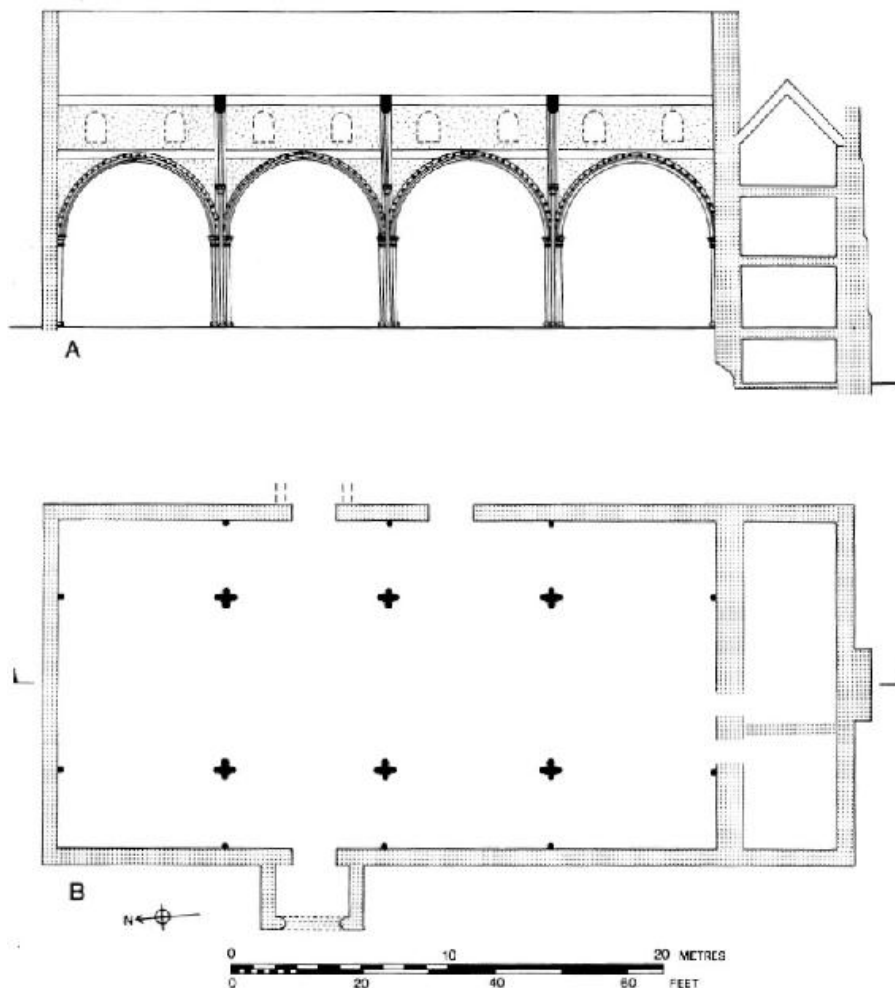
The Bishop's Palace: reconstructed plan and longitudinal section by John Blair (1987)
